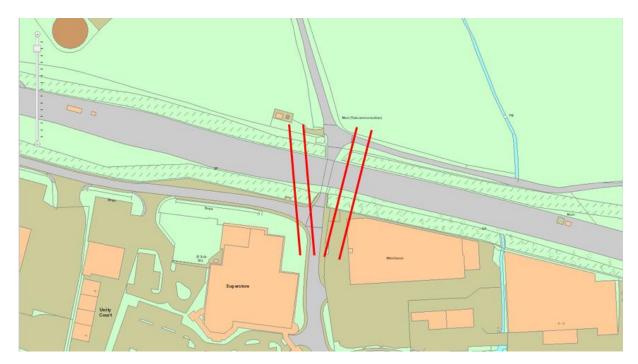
Plan of Broadmead Lane Bridge showing off-line options to east and west
